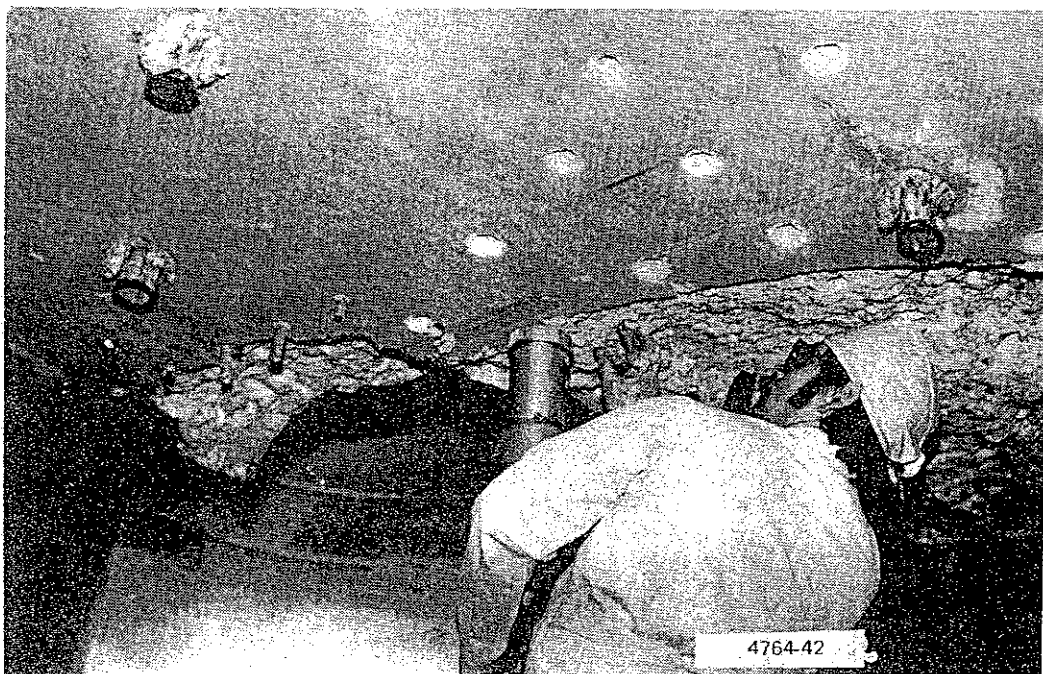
Using Rock Splitter to Form Cracks in Concrete Ceiling
